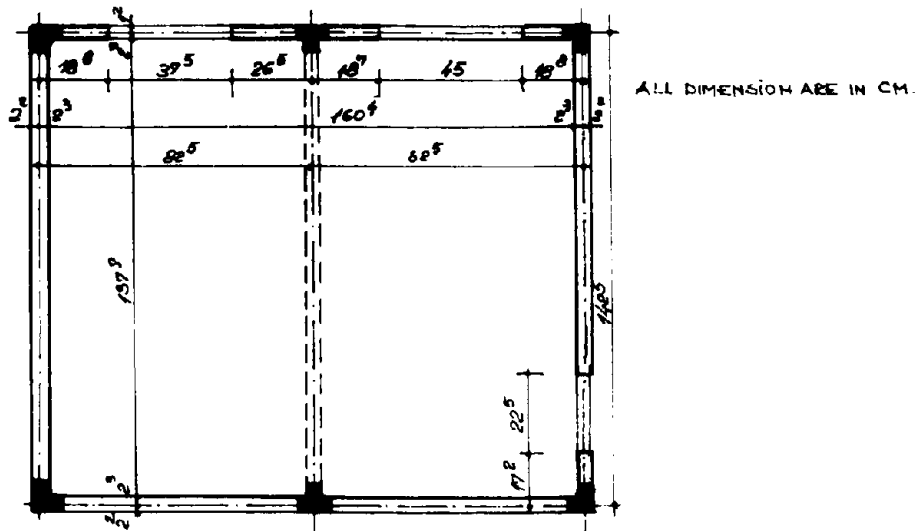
FLOOR PLAN OF A MODEL OF E1 CORE IN .3
